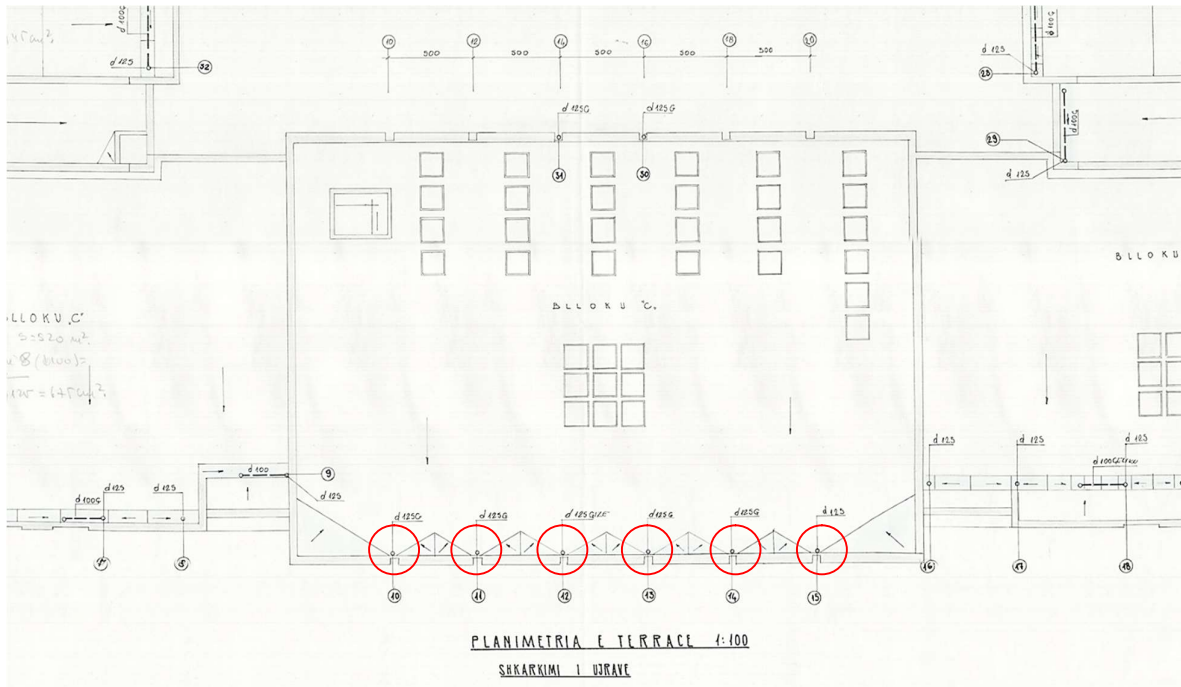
6 existing rainwater discharge columns in the roof plan
